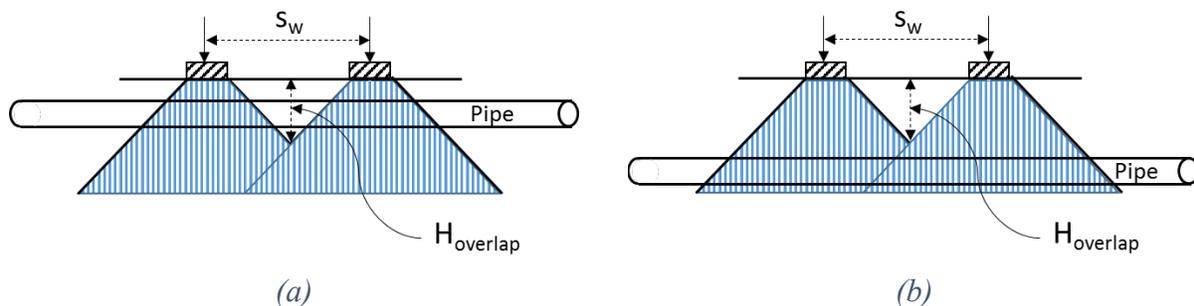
Load Distribution for the Direction Transverse to the Pipe Span.
